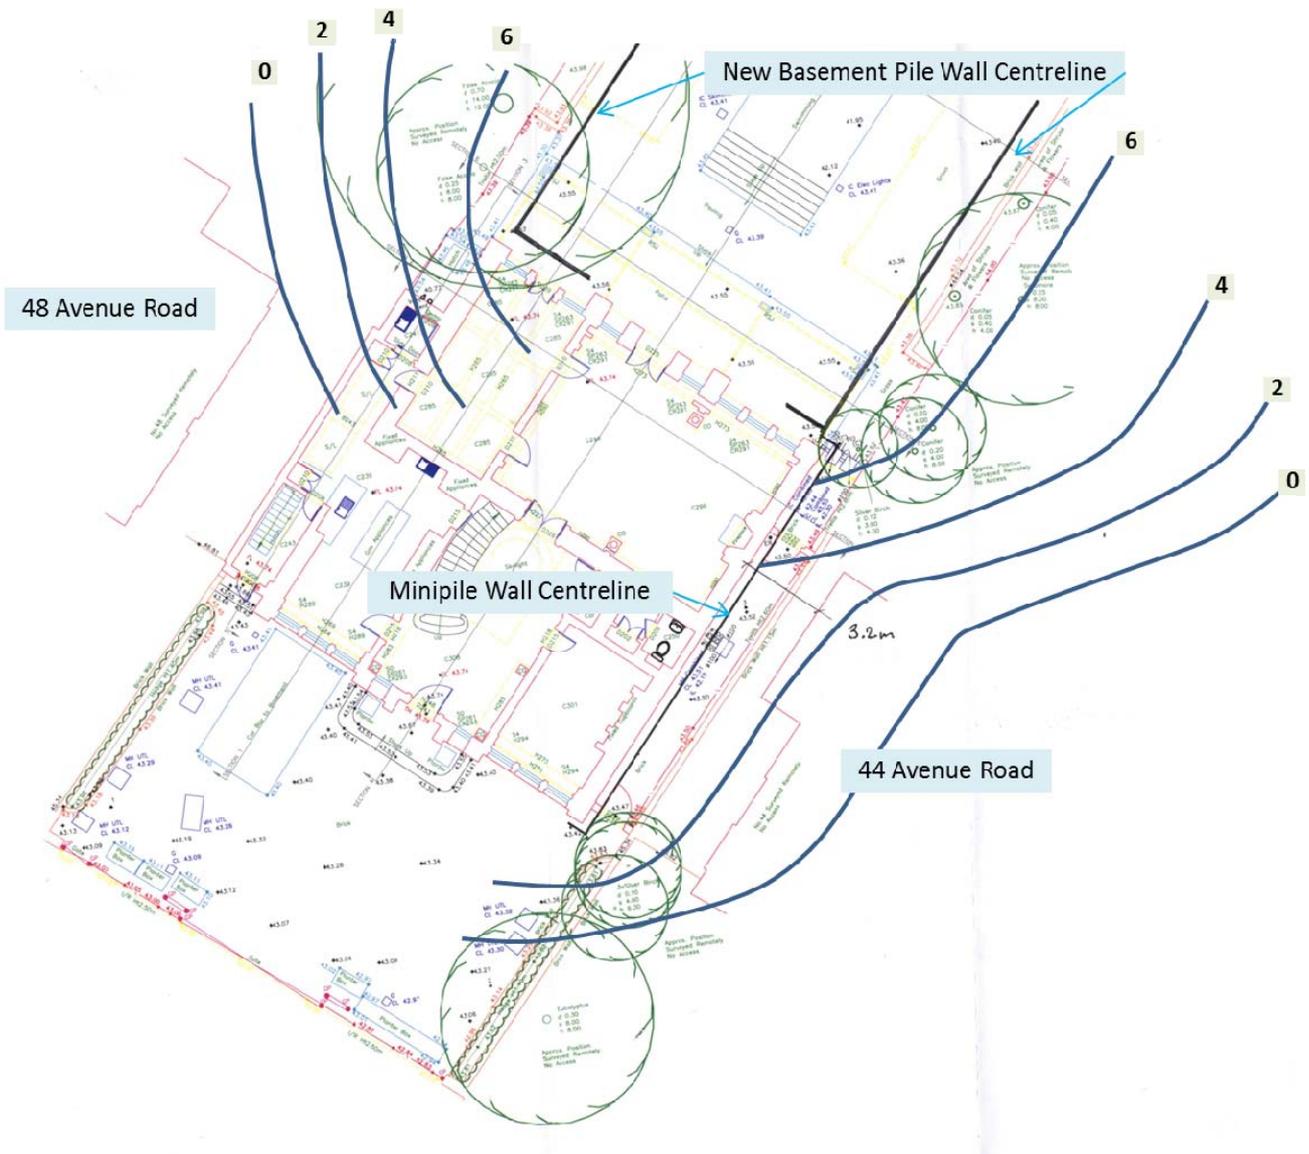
Southern half of Site: Contours of ground settlement arising after basement excavation (in mm)
